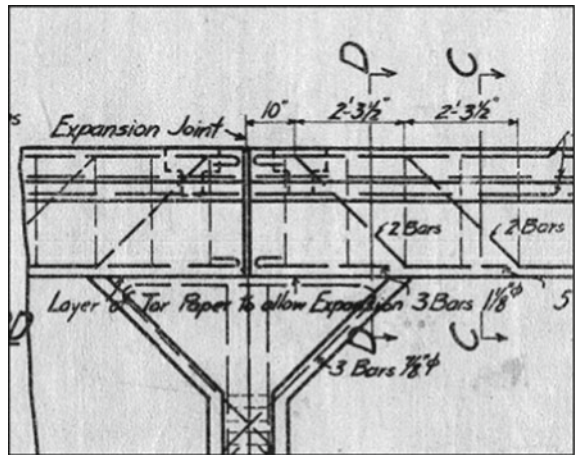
Crossbeams in the frame supporting the Greenhill mine tippie structure—the minimal cover (about 10 mm) for the steel in the beams can easily be seen
